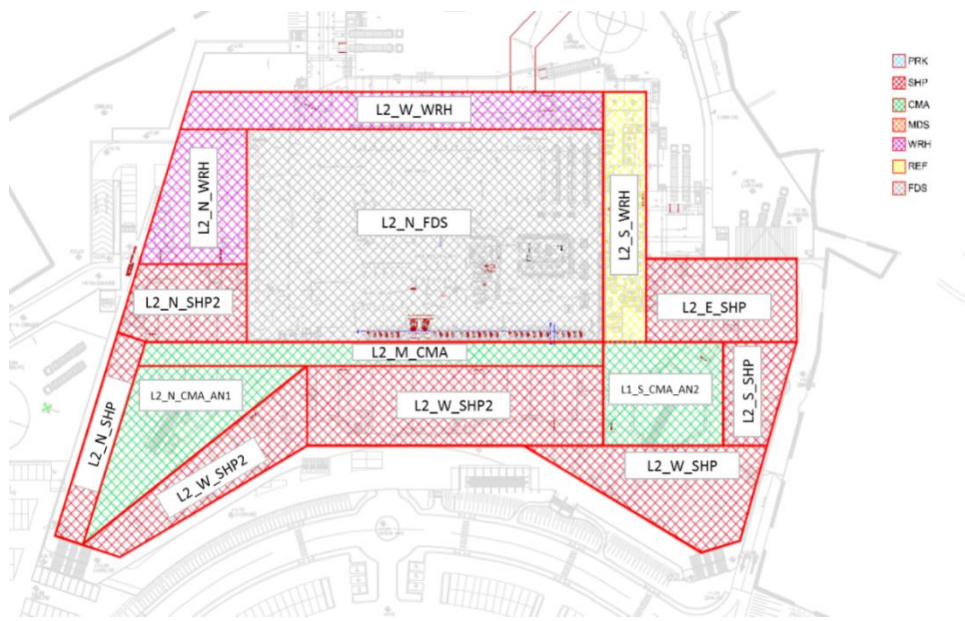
Katane' reference building: second floor plant with thermal zoning.
